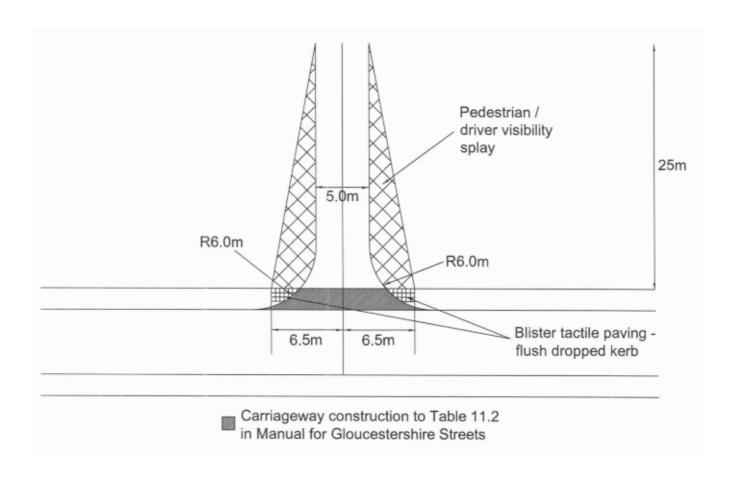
Standard access to 2 to 5 dwellings over footway (to be used on Class 3 highway).
